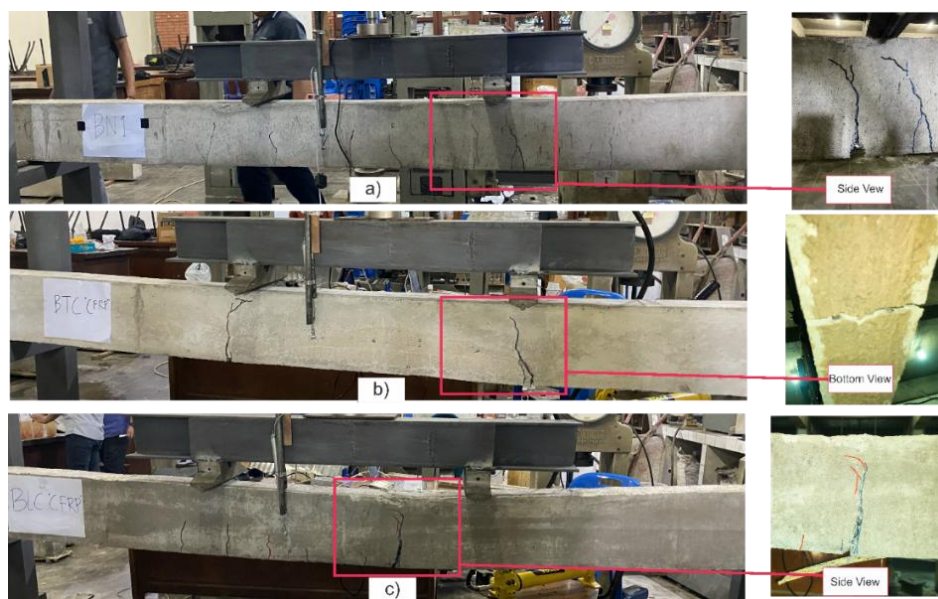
Crack Pattern of a) specimen BN, b) specimen BTC, and c) specimen BLC
